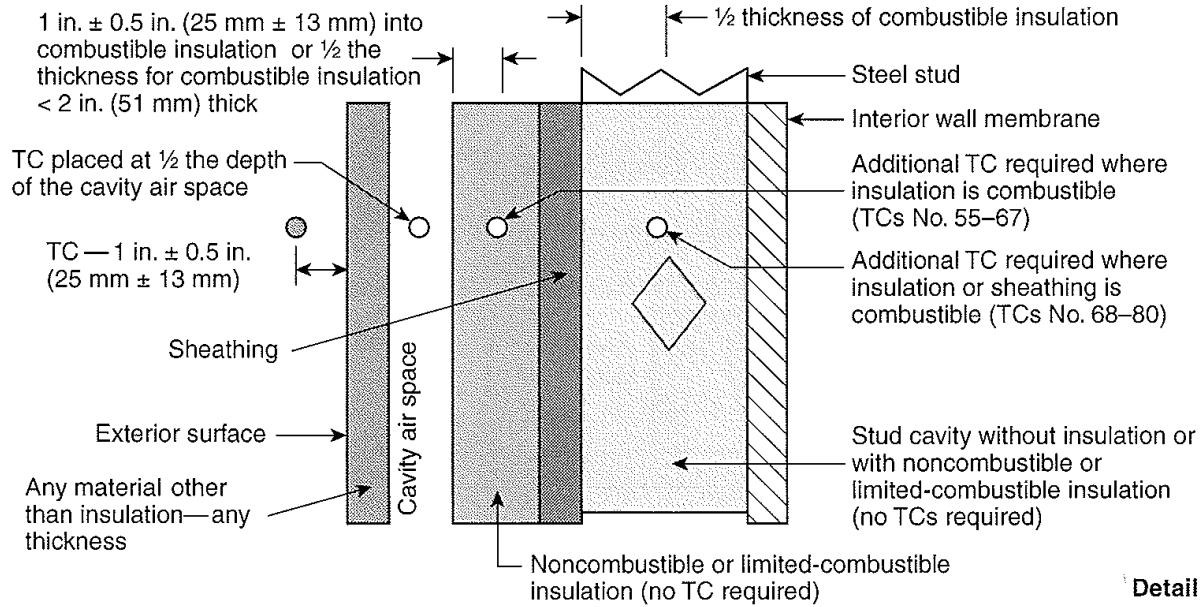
(c) Interior View of the Test Specimen. Instrumentation arrangement.
